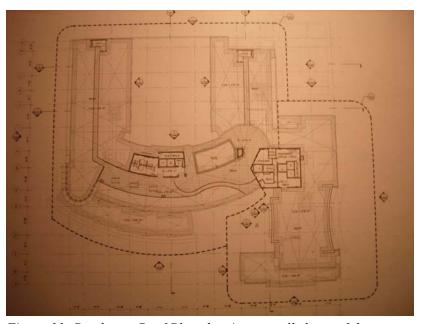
Penthouse Roof Plan showing overall shape of the upper floors and location of penthouse amenities.
